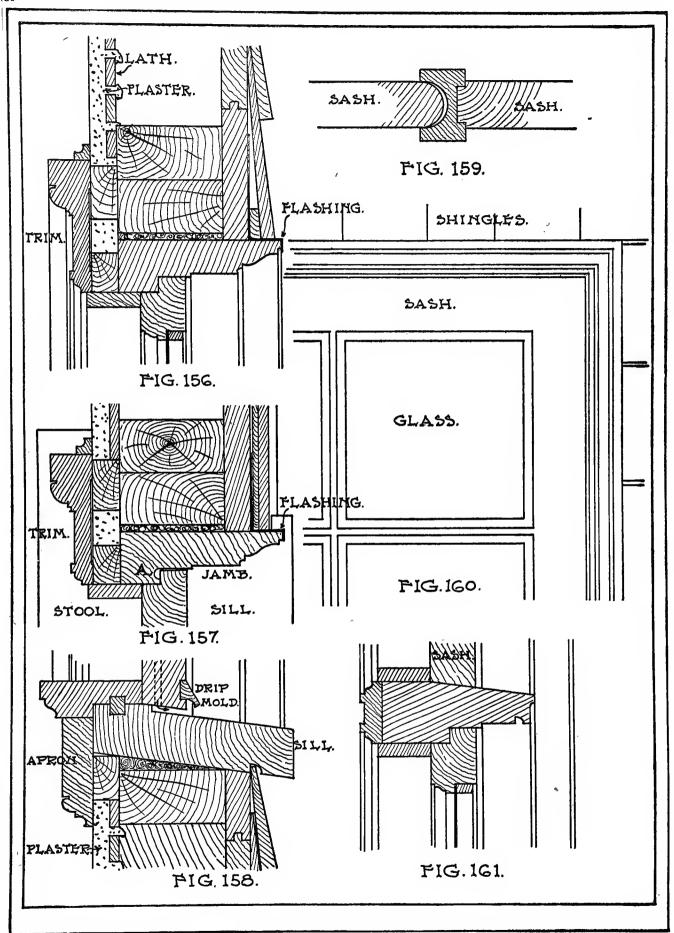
CASEMENT WINDOW WITHOUT OUTSIDE ARCHITRAVE
